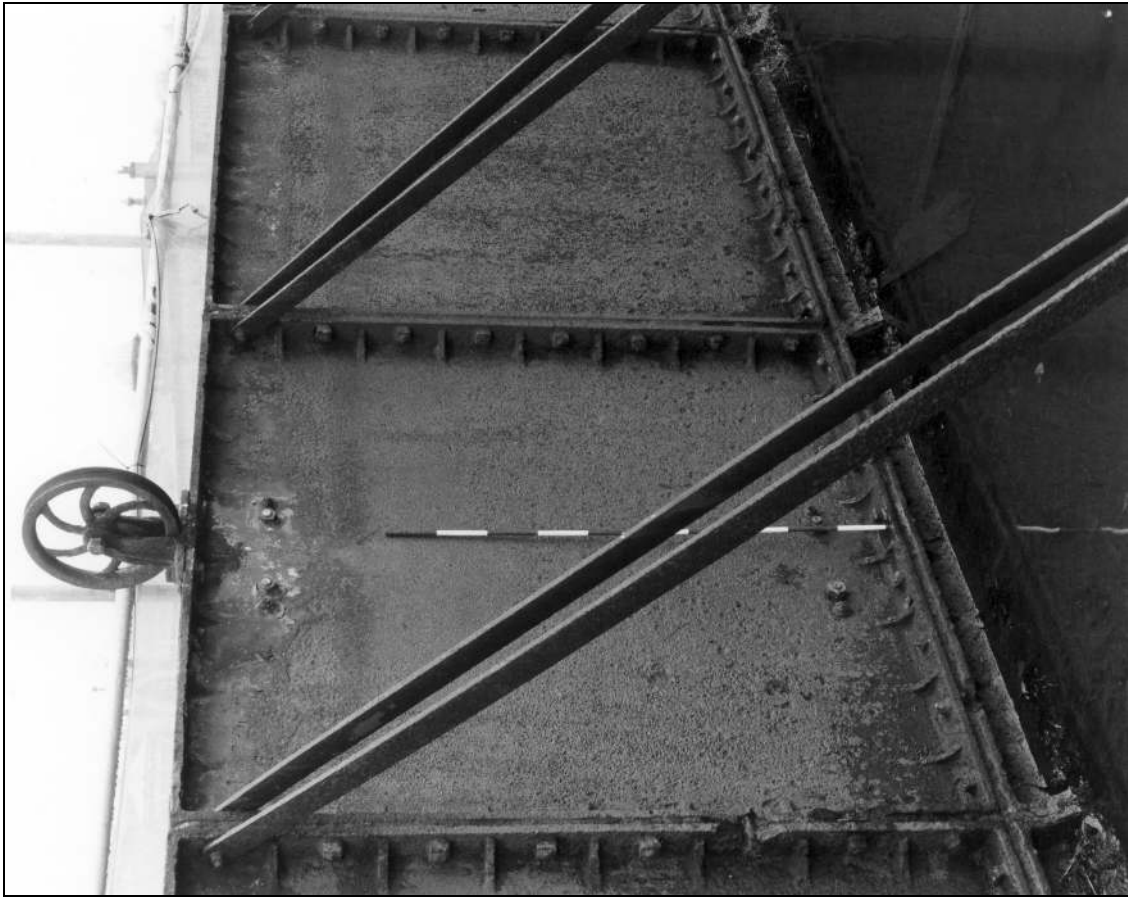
Pulley for level gauge, on west side of tank (film 7, frame 3)
